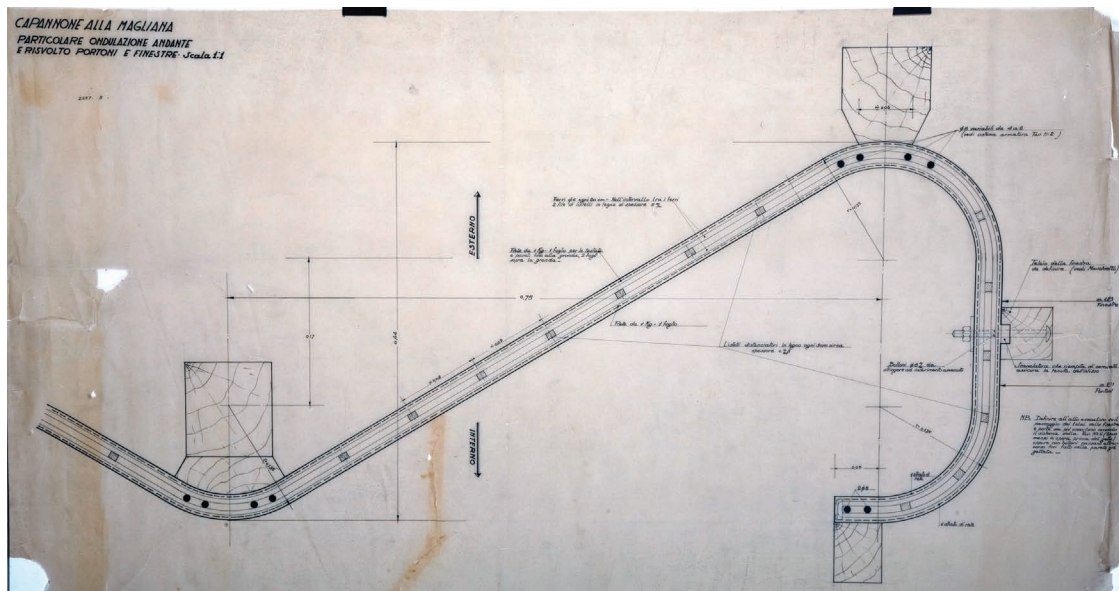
Detail of the ferroconcrete wall of the Magliana warehouse, sd 1944 (reproduced by agreement of CSAC, Parma)
